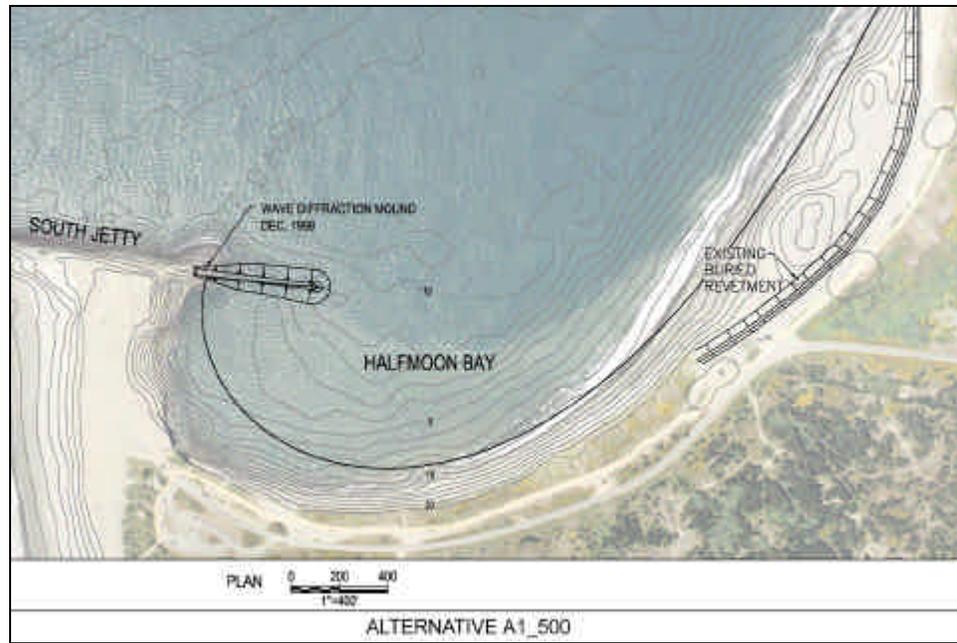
Equilibrium planshape for a control point consistent with Alt A1\_500
